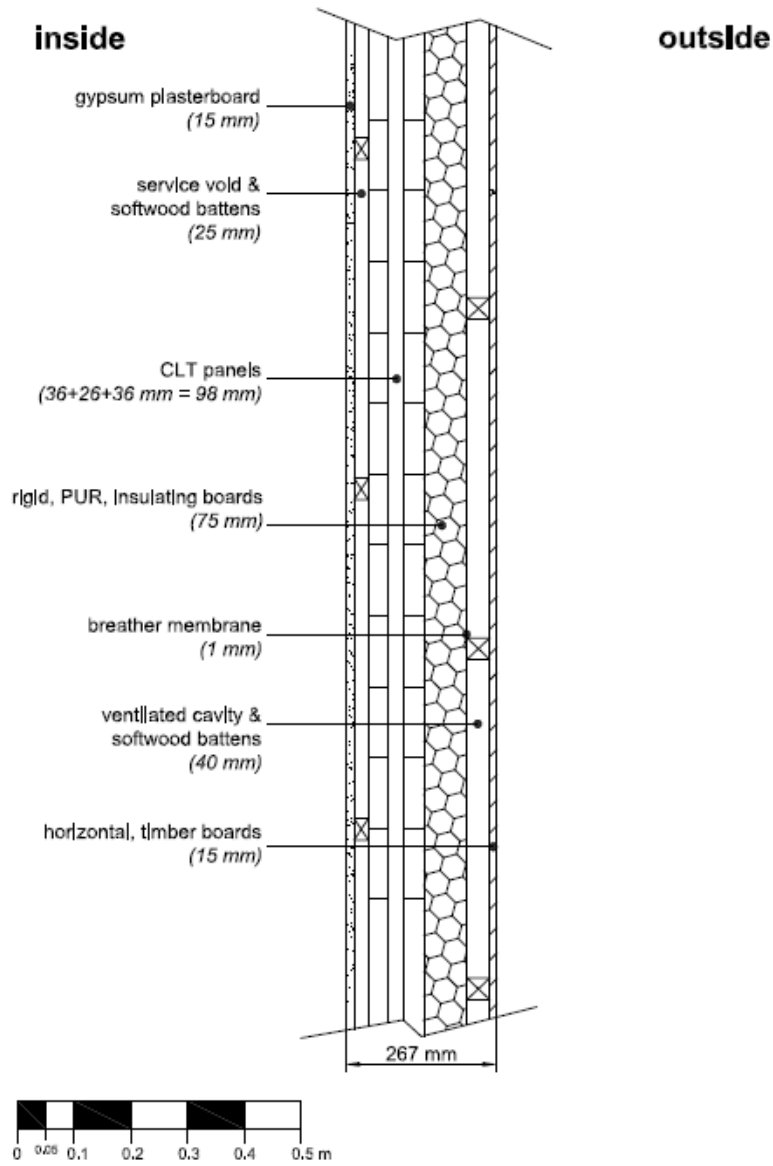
Wall D2 (cross-laminated timber (CLT), external solution: timber cladding), horizontal section.
